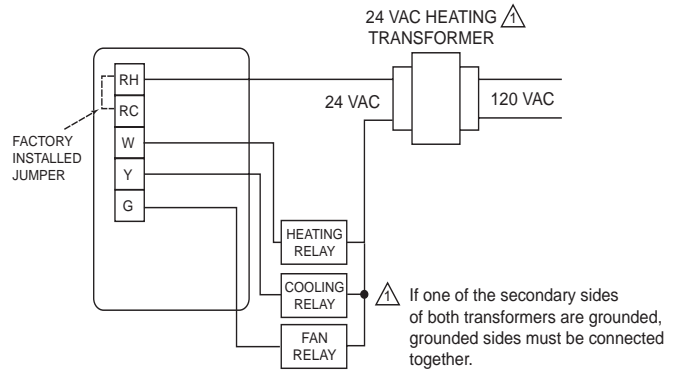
T205 Wiring To Heating/Cooling System With Single Transformer.
